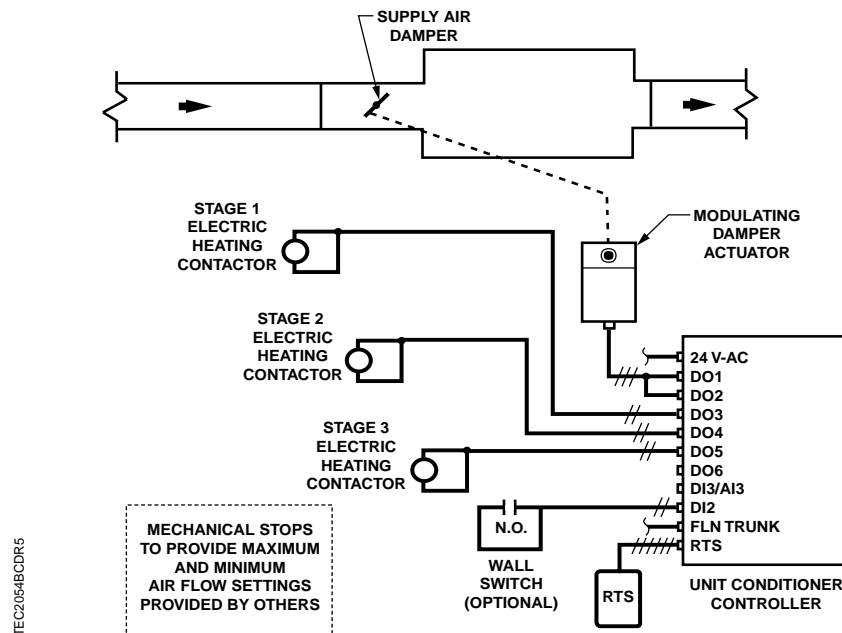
Application 2554 with Modulating Damper Control Drawing.
